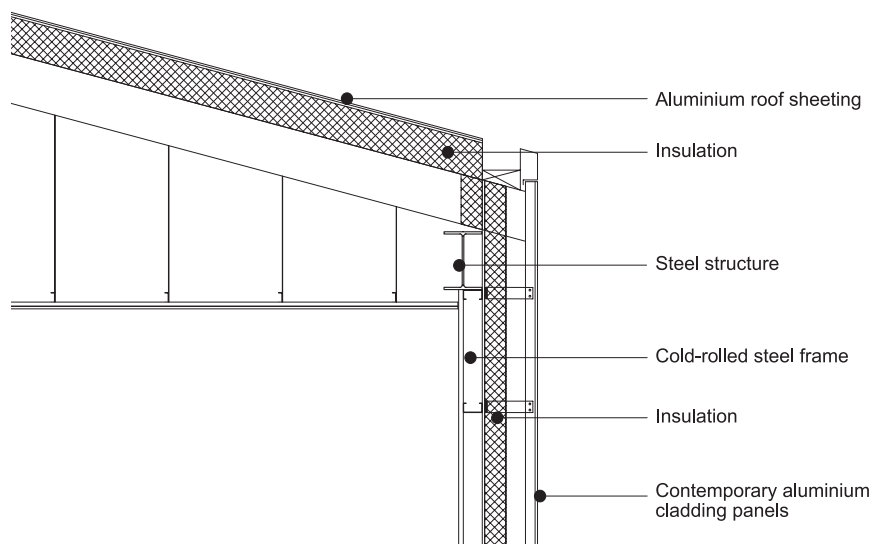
Partial section of the roof and wall design: initial scheme. (Source: Author.)
